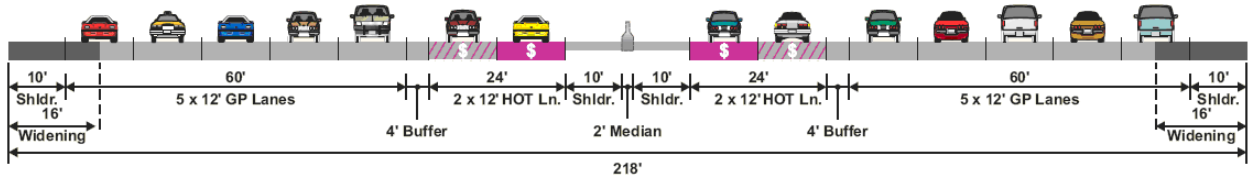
Typical Cross Section – Alternative 5 (Montrose Road to Spur)
